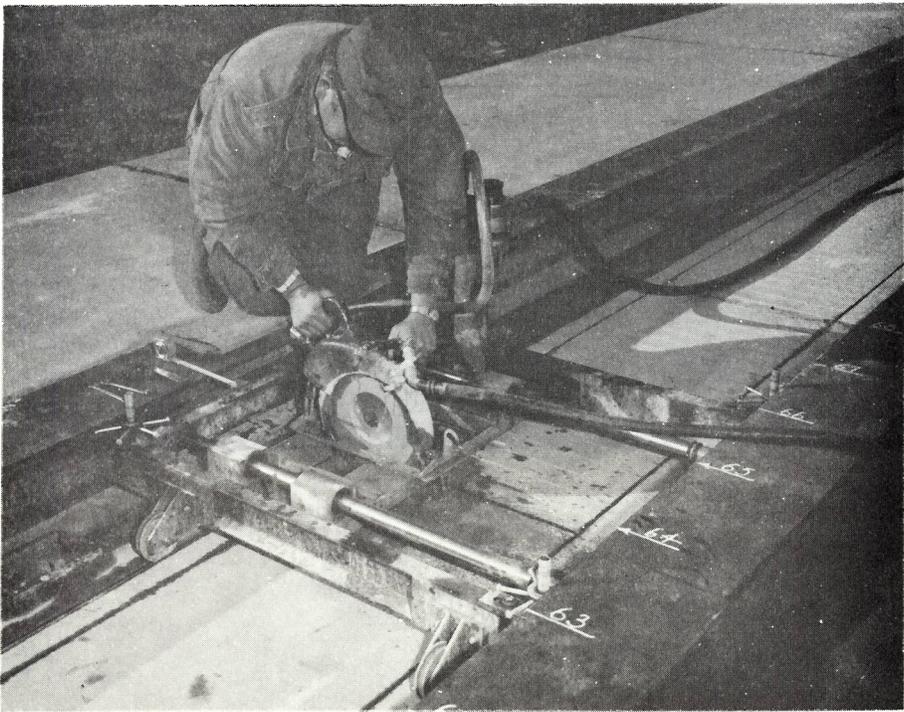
MACHINE FOR INSTALLING SAW-CUT GROOVES IN THE TEST SECTIONS
